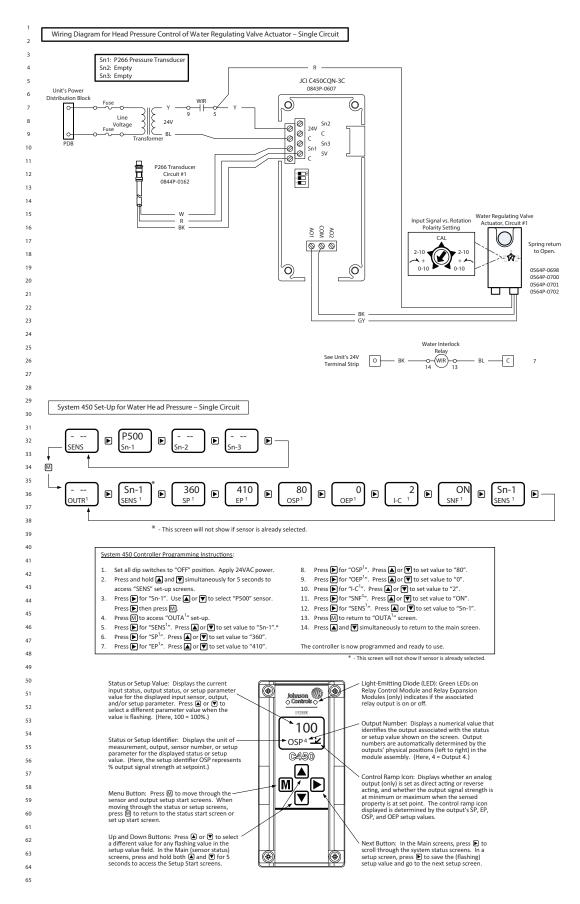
Controller Wiring for Water Regulating Valve for Single Circuit Unit
